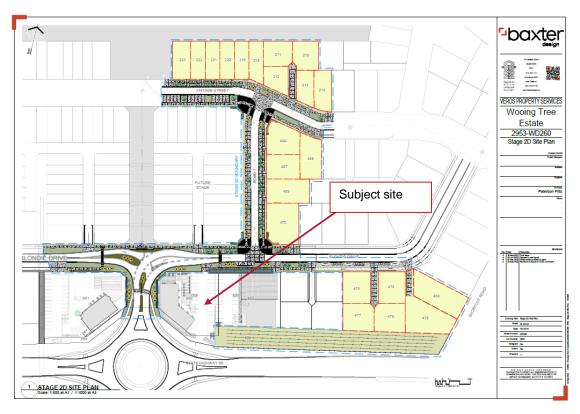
Wooing Tree Estate Stage 2D Site Plan. (Source: Baxter Design, via CODC).
